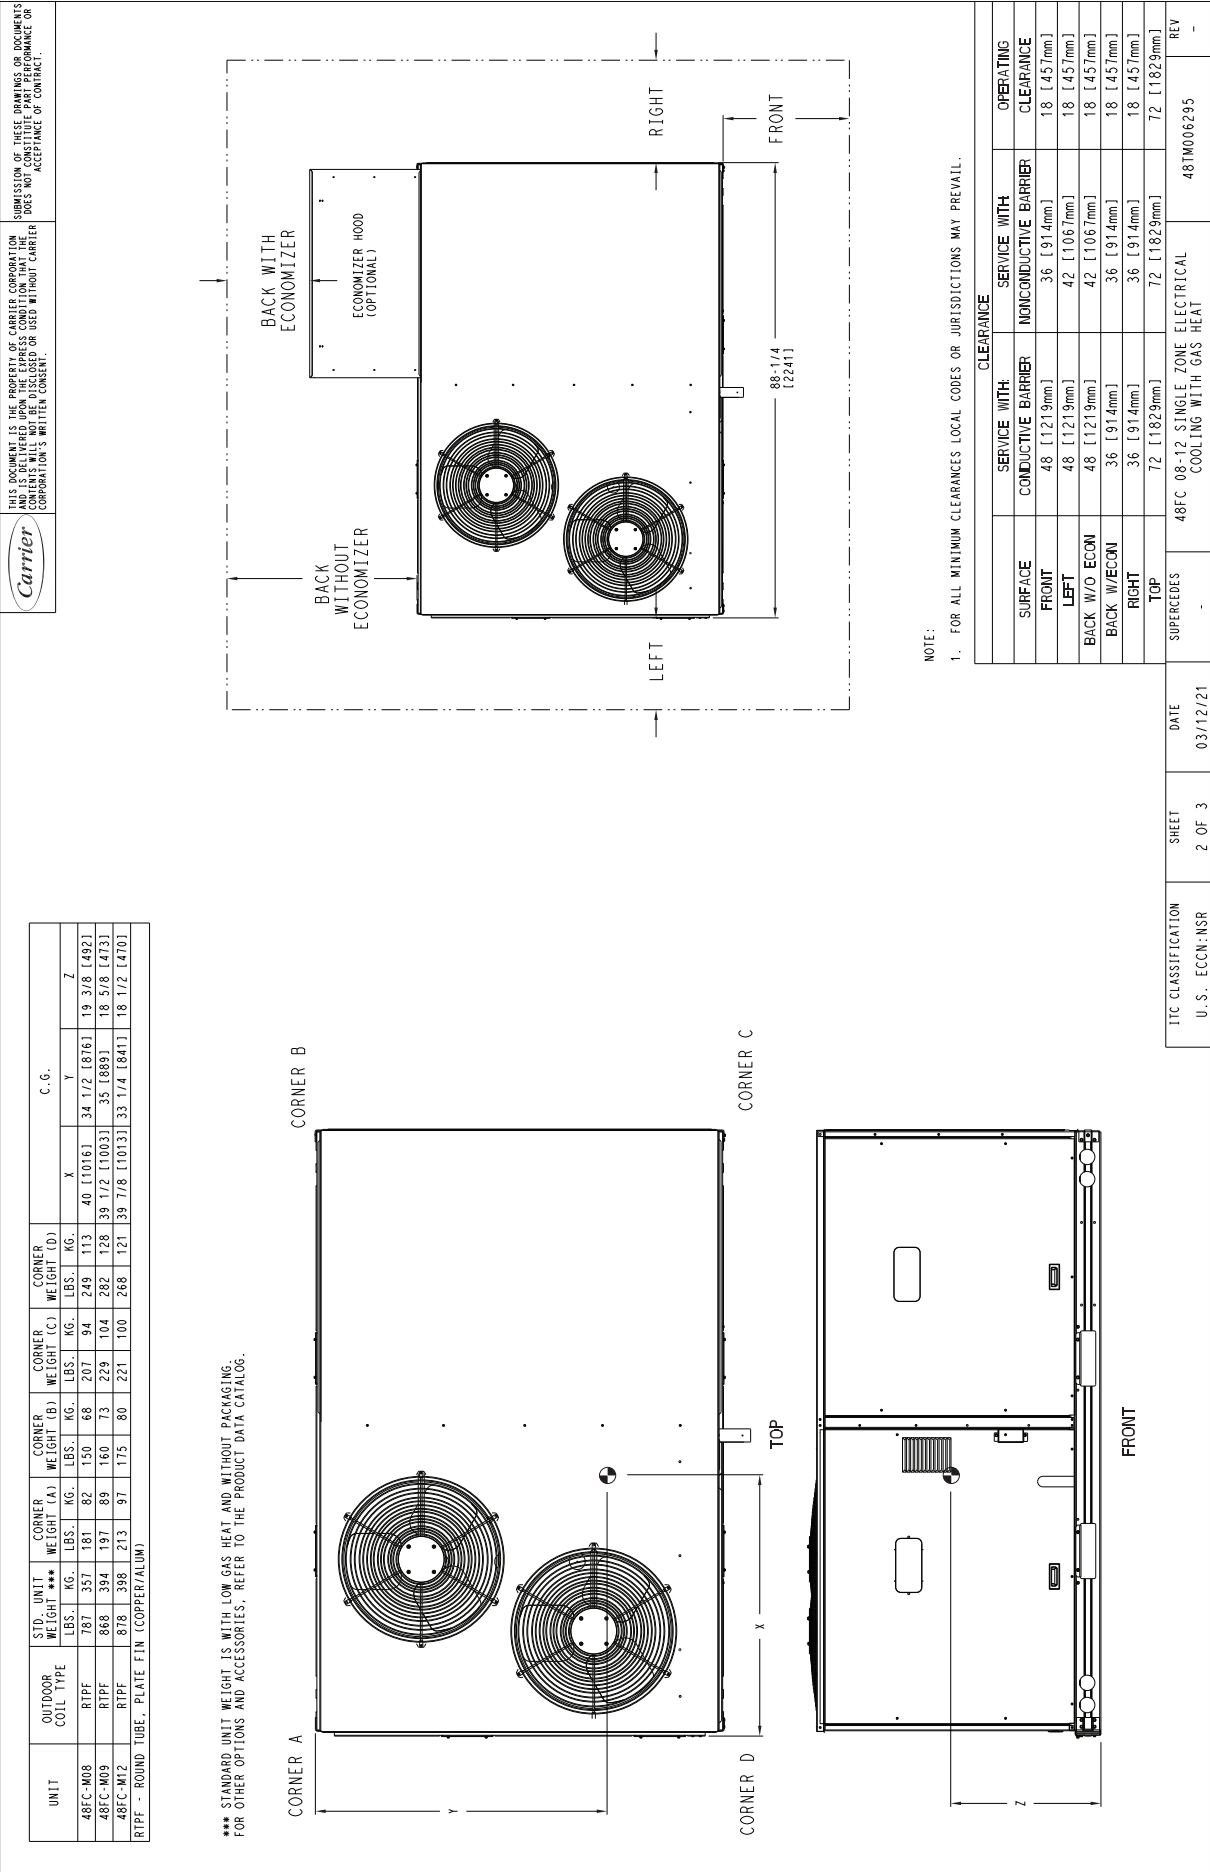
Unit Dimensional Drawing – Sizes 08, 09, 12 (cont)
